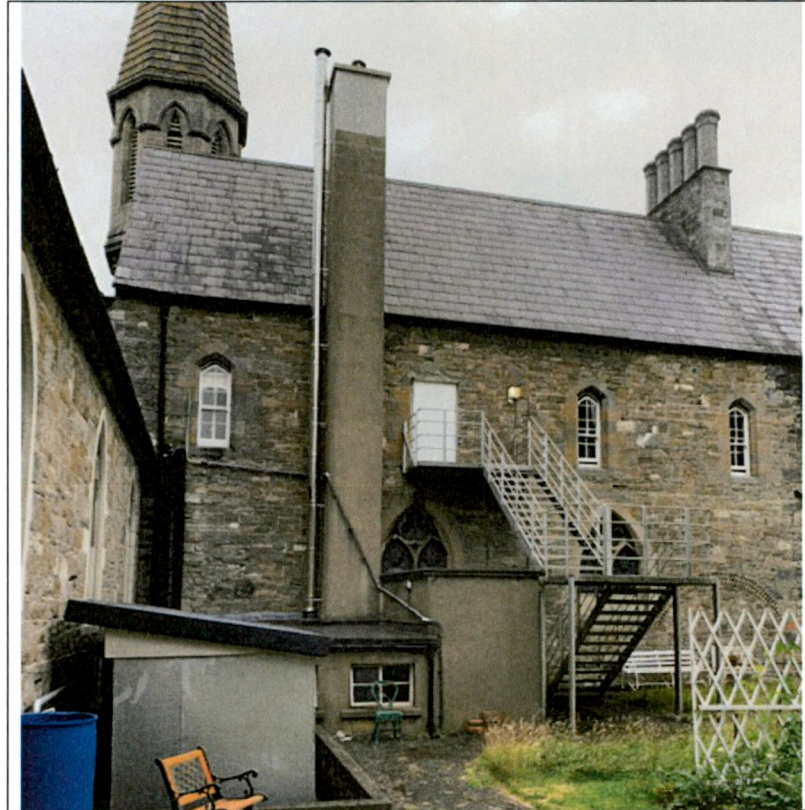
Existing view with metal external stairs to be replaced by new Stairs 01 – note also the modern white doorway at the top of the existing stairs to be infilled with stone to match surrounding materials and bonding pattern.
